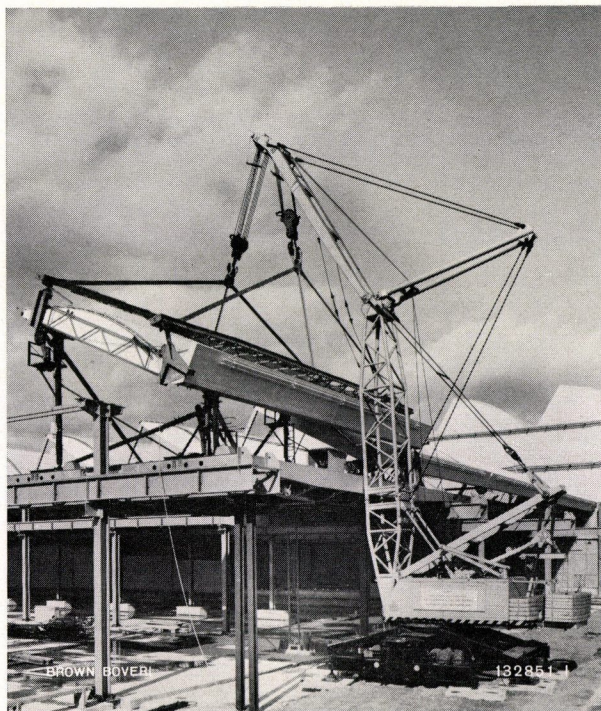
Placing the sections on the crane cross-beams with 60-t mobile crane
